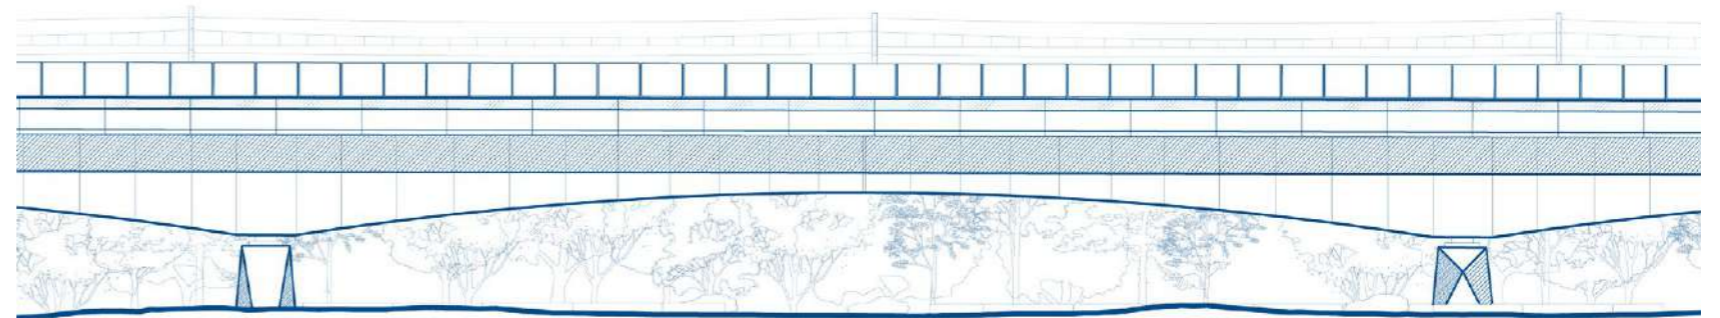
\_ Proposed elevation - Typical 4m opaque barrier over the A412
